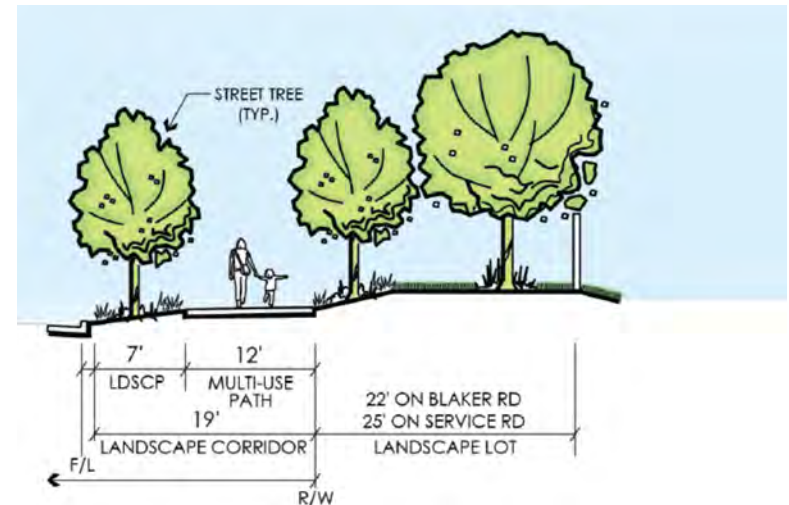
MULTI-USE PATH DESIGN SECTION
